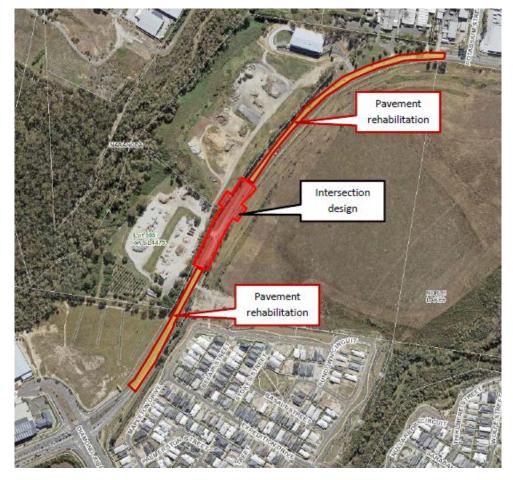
Boundary Road - intersection and road pavement rehabilitation - separable portion 1
